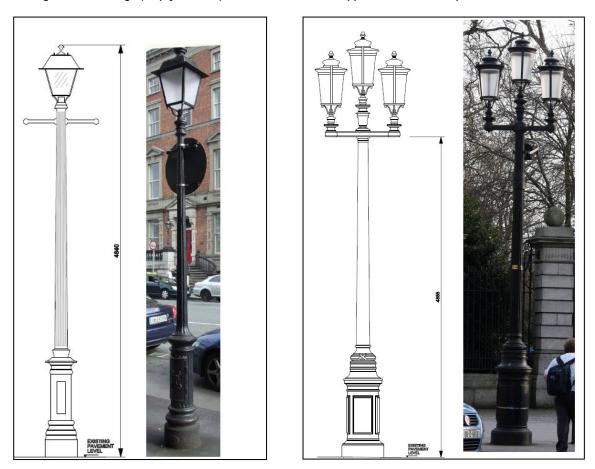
Details of traditional style lamp standards (single lantern to left and three lantern to right) on the perimeter of St Stephen's Green Park (TII)
